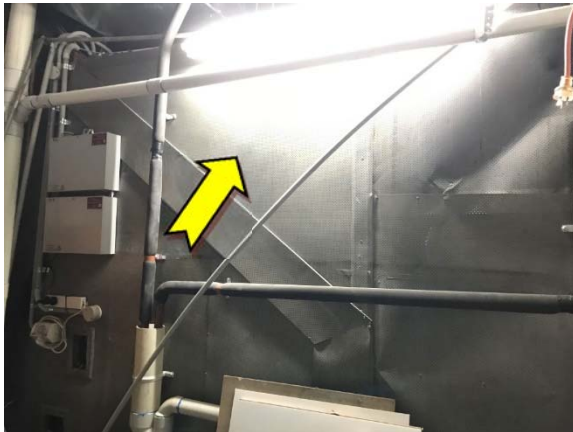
Interior, level 1, ceiling space, to pipework – suspected SMF external insulation.
